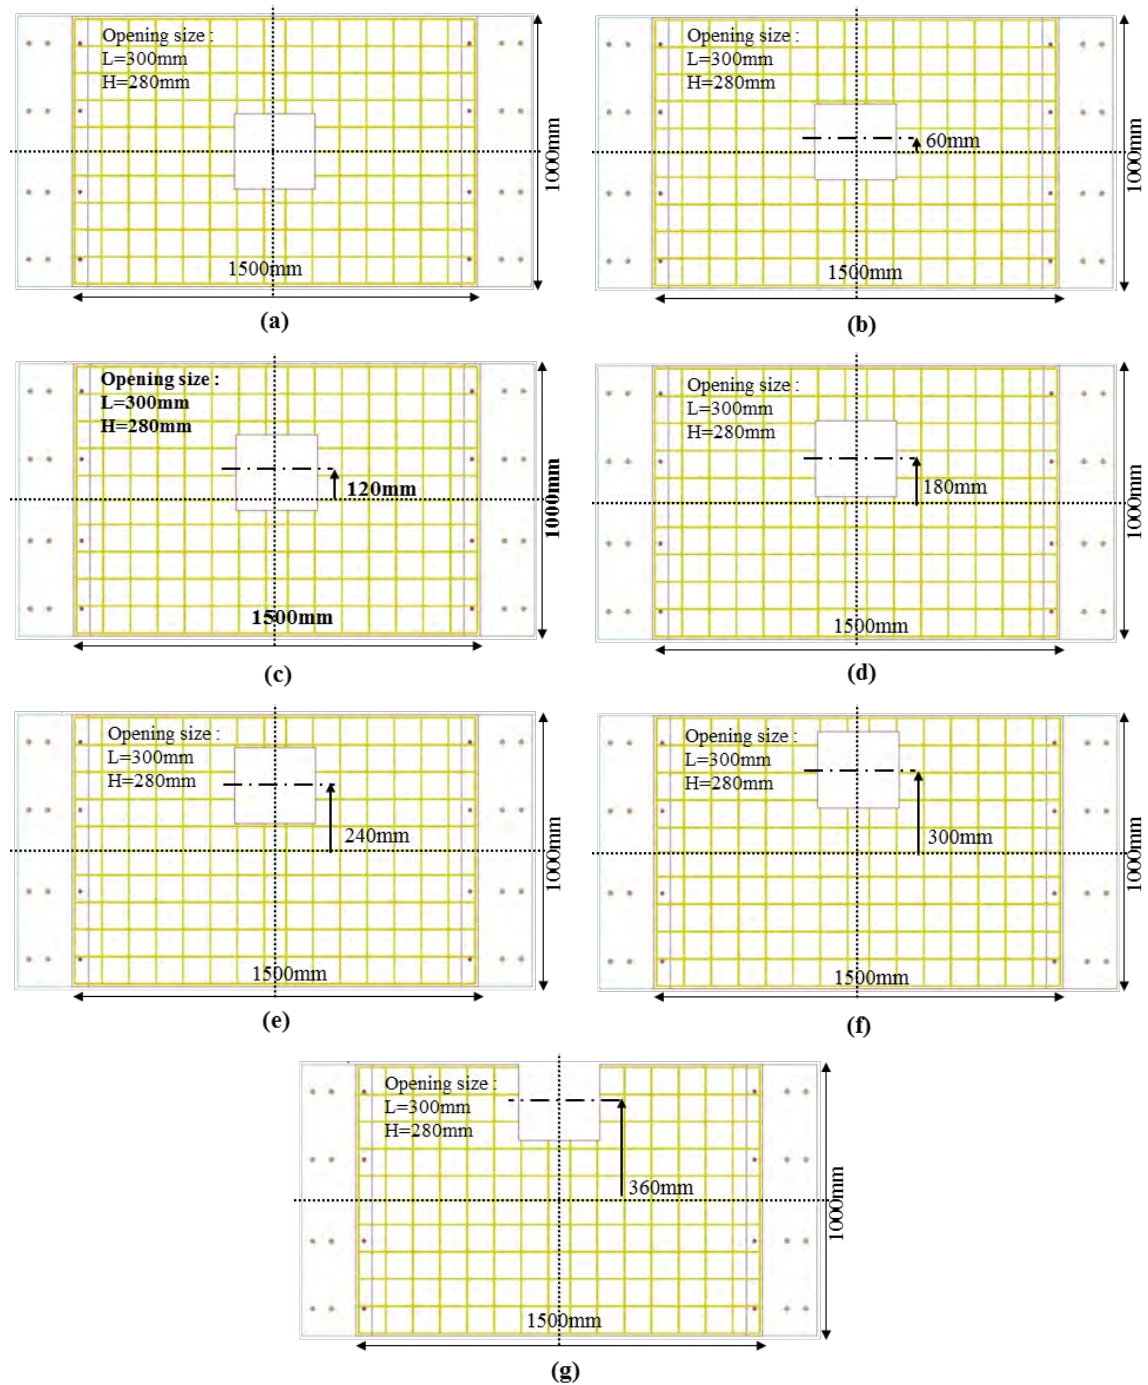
Details of unstiffened opening location-Transverse direction (rotated front view)
